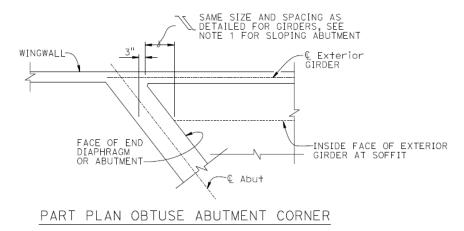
Stirrup Reinforcement at Abutments (Sloping Exterior Girder)
